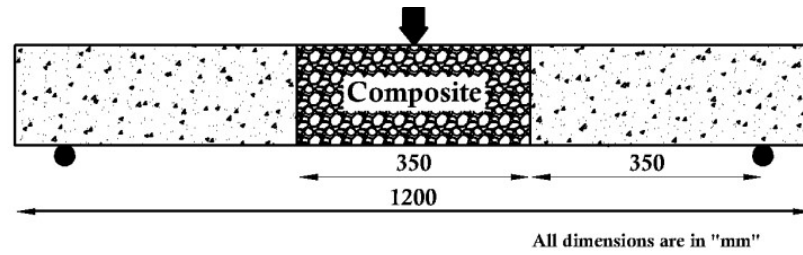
Detailed configuration of R.C beam specimen with test set up
